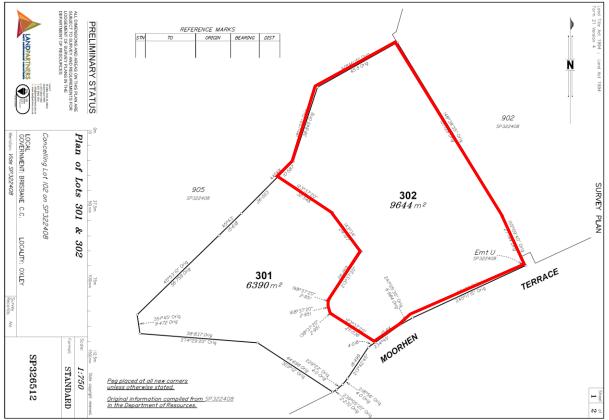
Proposed Subdivison Plan – Site oultined in Red (Source: LandPartners)
